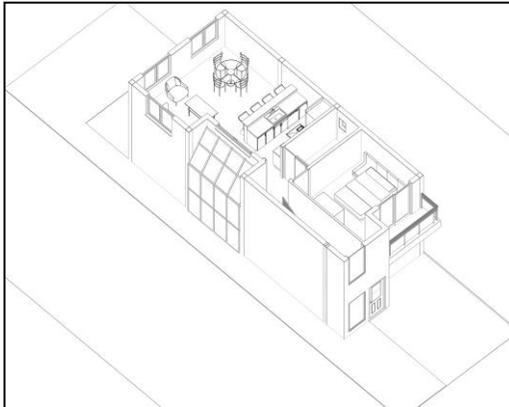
First floor 3D plan in stage two – bold lines show created elements
